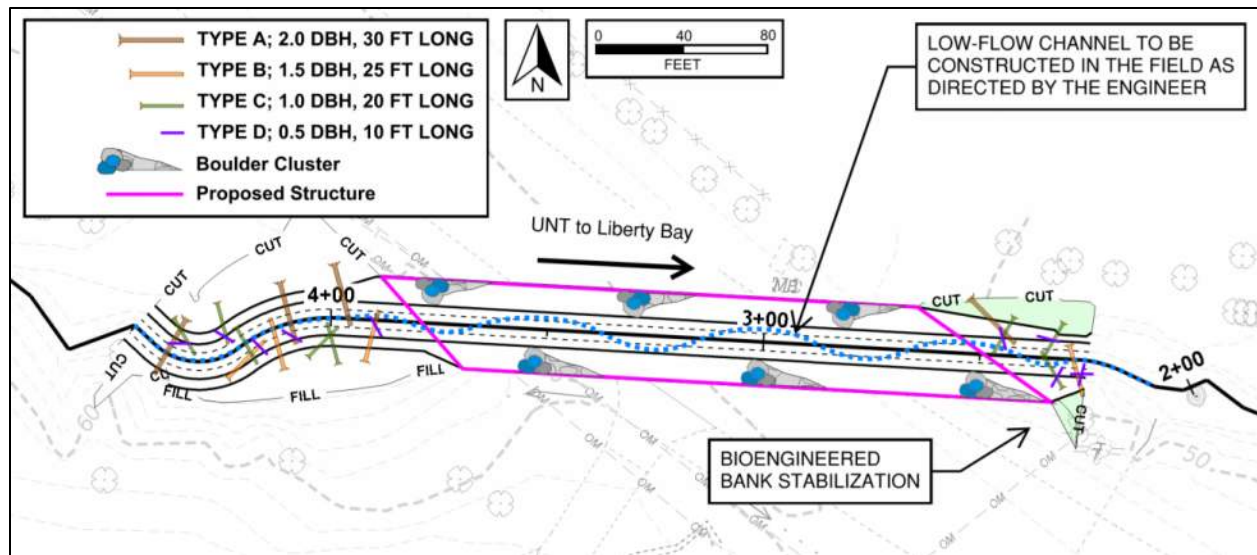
Conceptual layout of habitat complexity – culvert configuration
